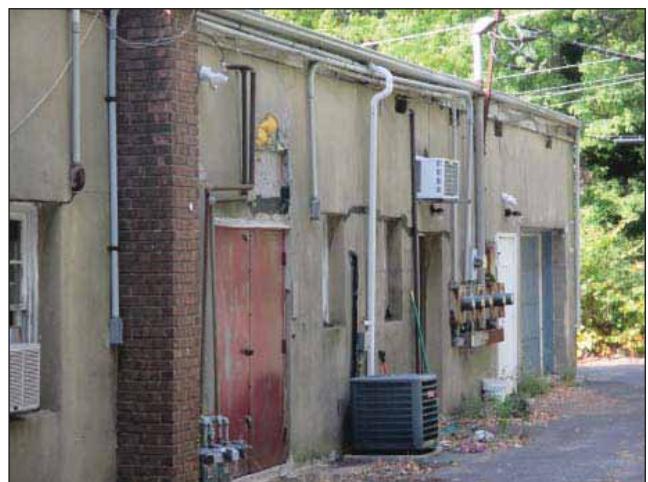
Roof drains directly onto the rear drive aisle, HVAC units on the ground. Doors open directly onto the drive aisle.
